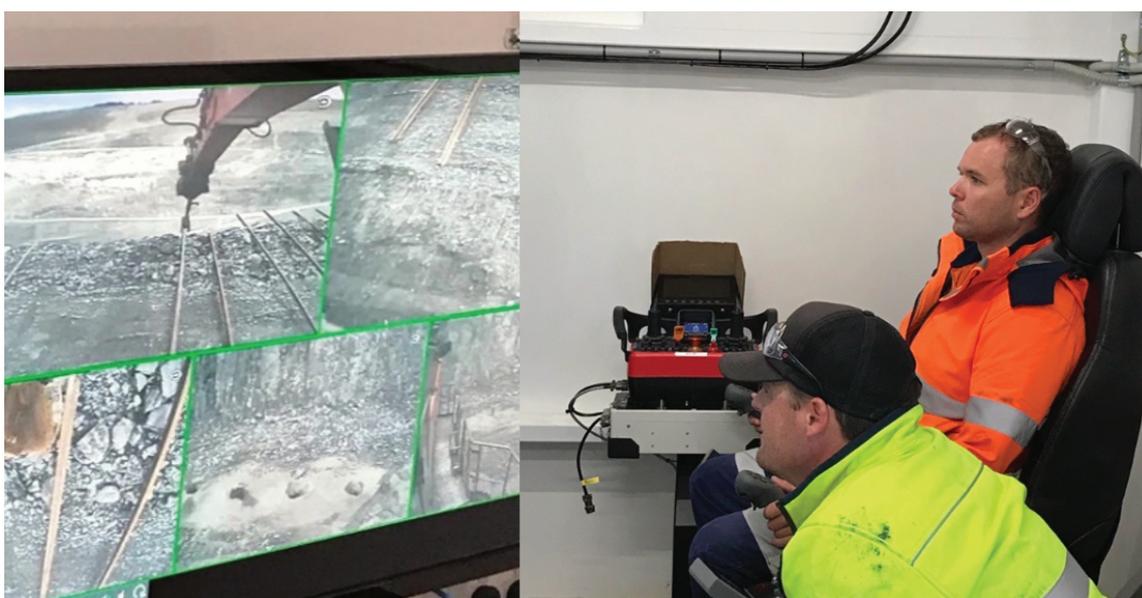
Operator installing shear pins remotely using in-house developed shear pin holding attachment
